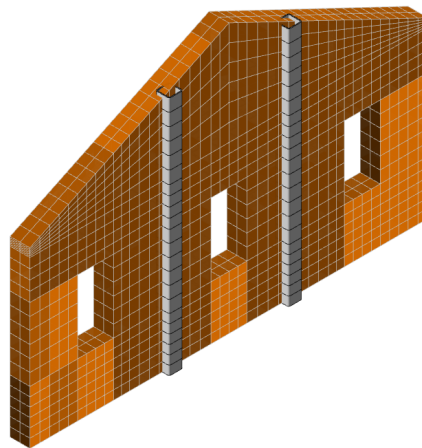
Isometric View of Fog Room Gabled Wall, Strong-Backs Scheme
